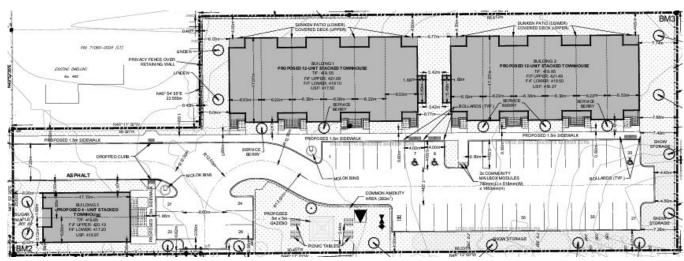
Site plan sketch prepared by Cobide Engineering, June 2024
